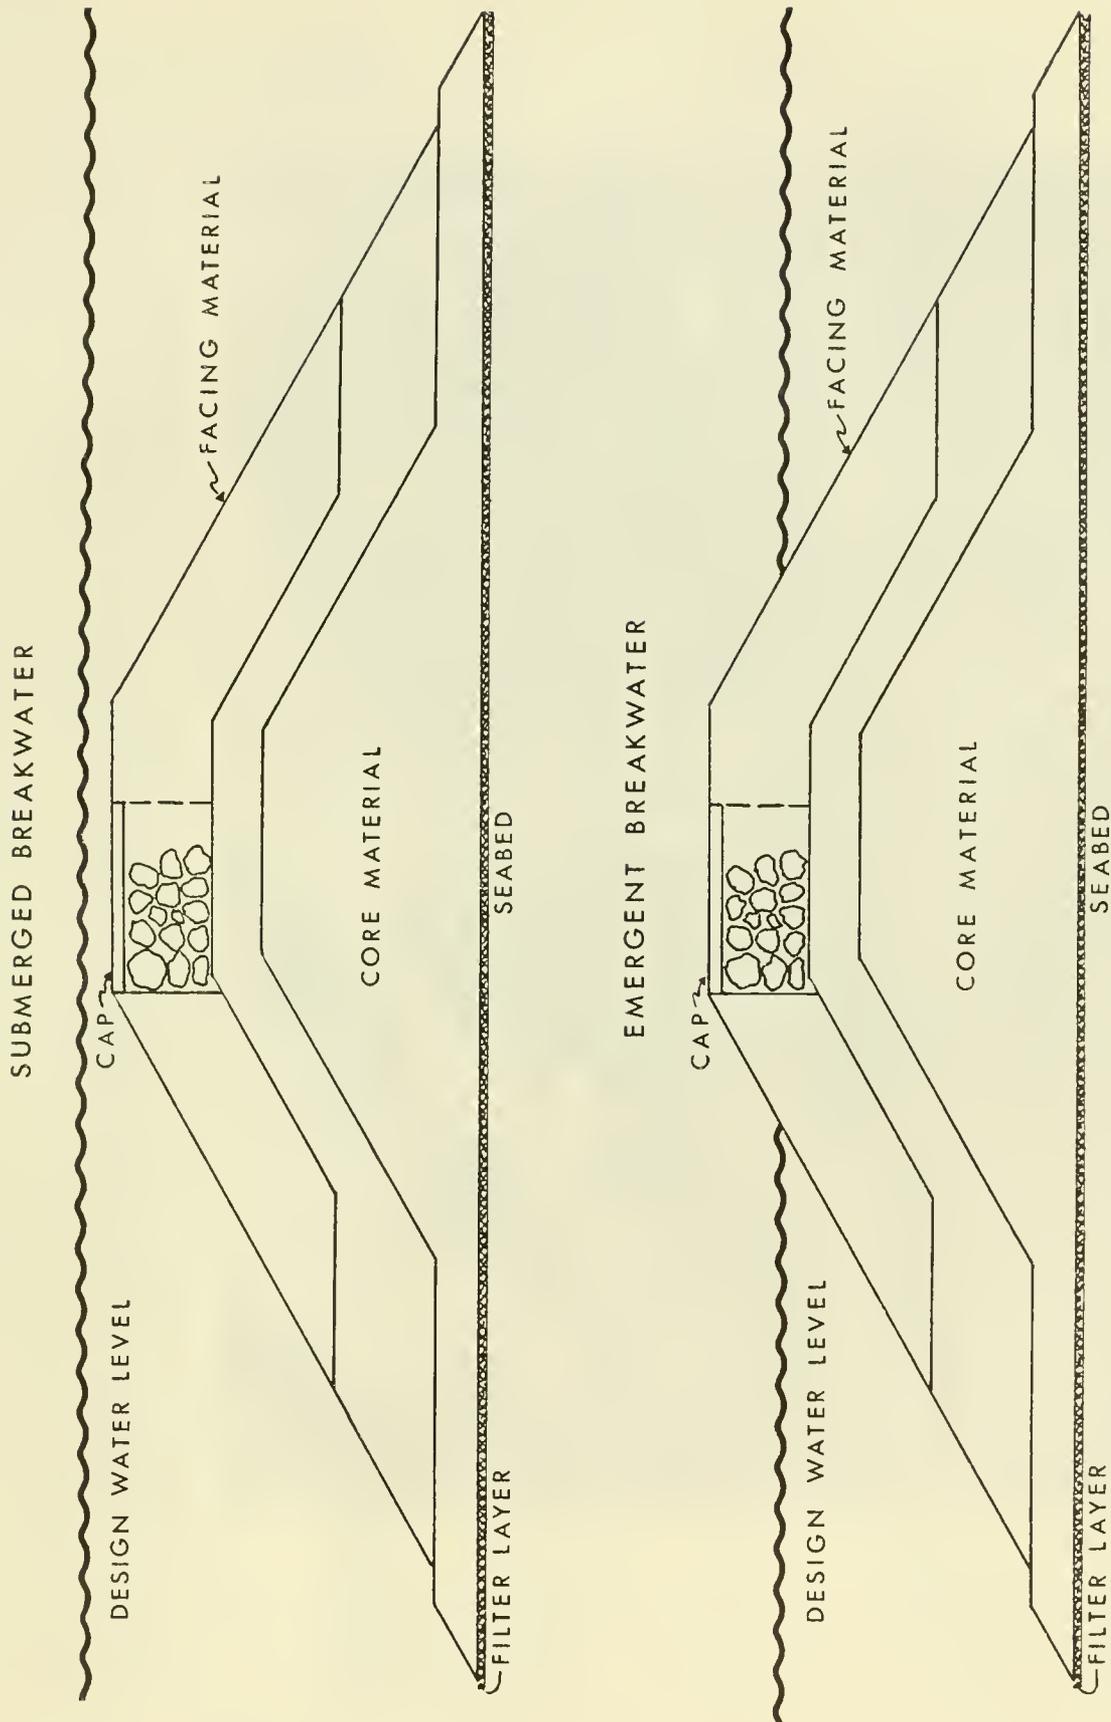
Cross-sectional view of typical submerged and emergent rubble-mound breakwaters. Dimensions and details are determined by particular site conditions.
